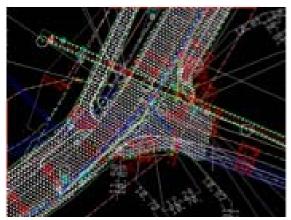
A 2D scene of the Deep Stabilization Plan for a Road Construction Project in Finland (CityCAD, Sito Oy).
